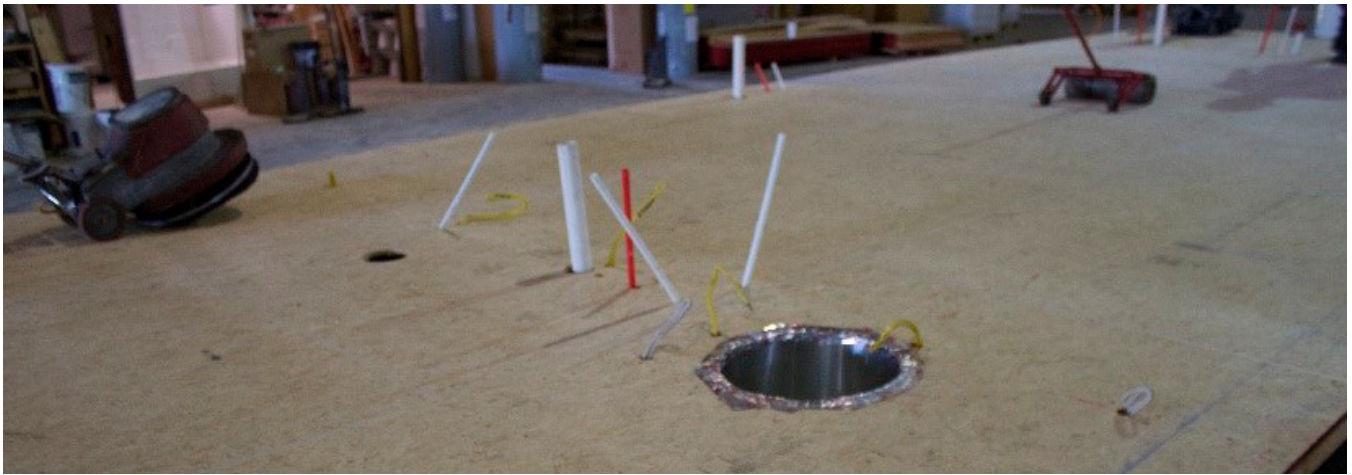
, 1.23 AND 1.24: THE FRAMING IS COVERED AND PENETRATED TO BRING ALL THE NECESSARY PLUMBING AND ELECTRICAL WIRING ABOVE THE FLOOR.
